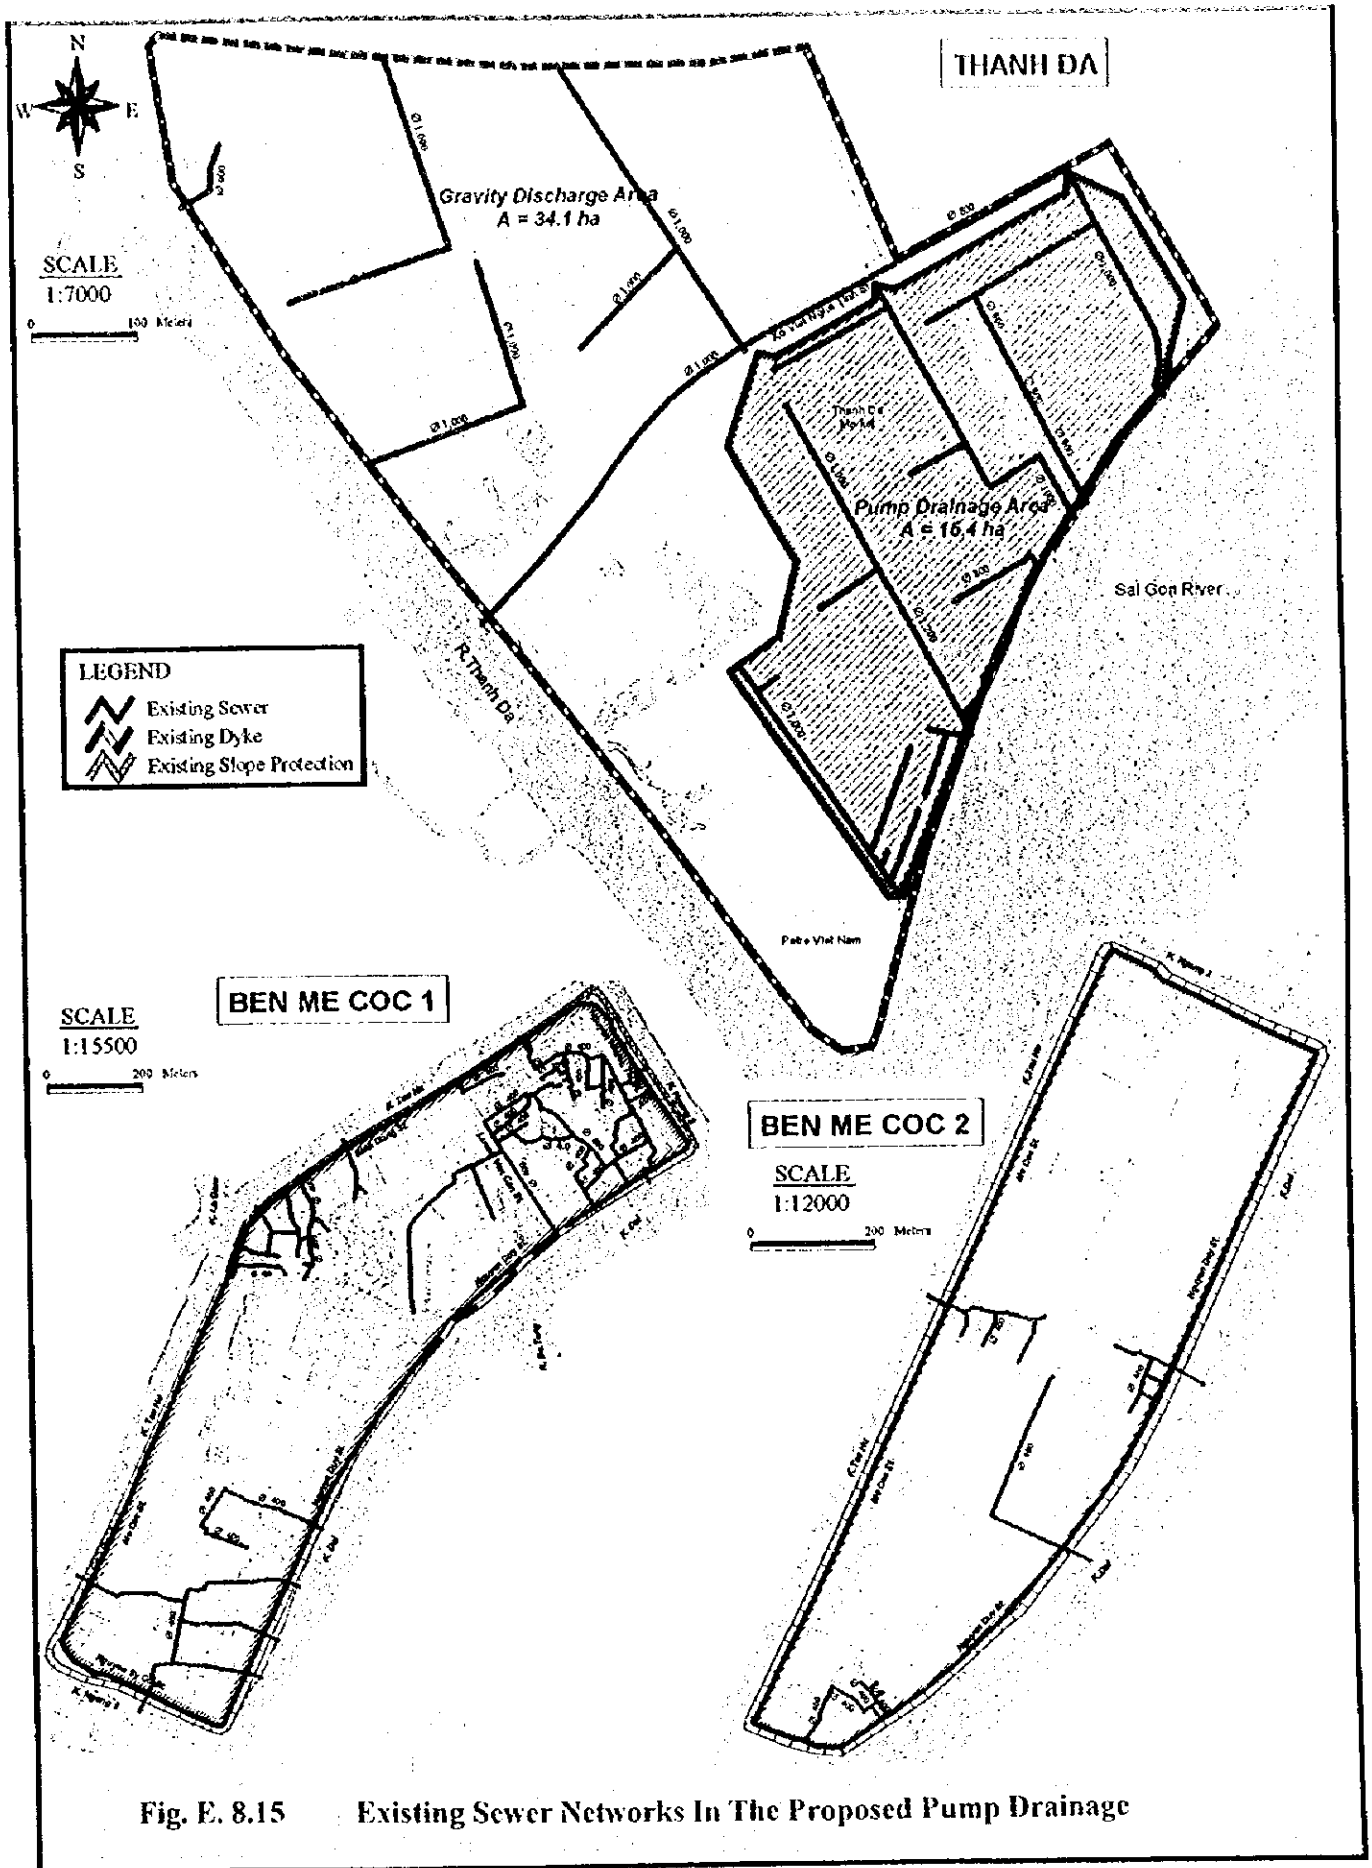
Existing Sewer Networks In The Proposed Pump Drainage
